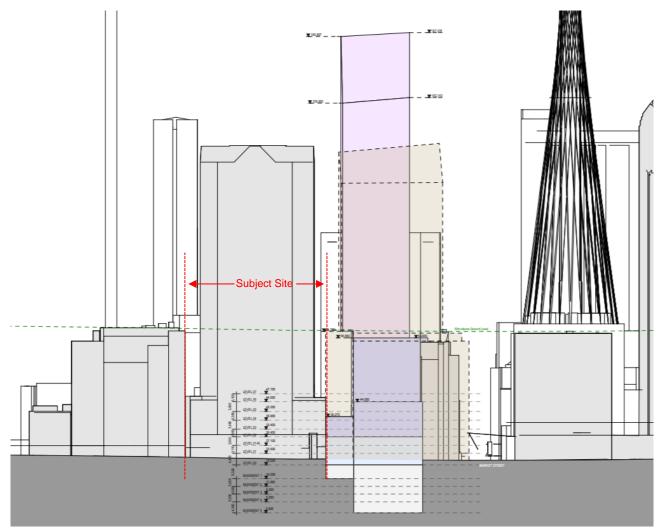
Extract of approved building envelope under D/2018/1246– Castlereagh Street elevation (showing the subject site indicated in red and the approved David Jones envelope in dotted lines with brown shading)
